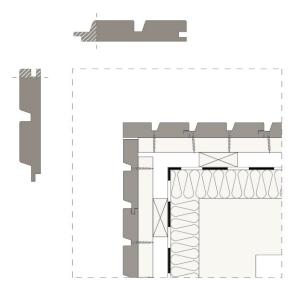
External corner finishing by cutting off both the tongue and groove edges of the two connecting boards
